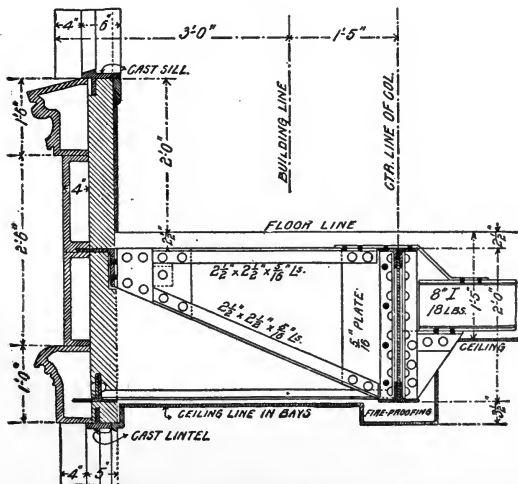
Spandrel Section at side of Bay Window. Reliance Building.
